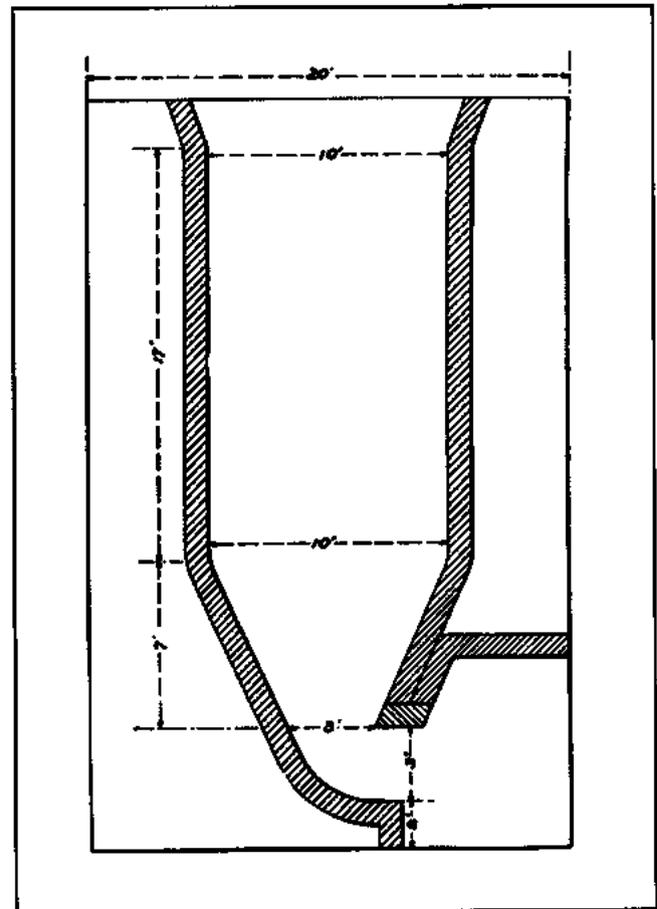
Cross-section of a typical kiln. Figure 20 from Albert Victor Bleining, "The Manufacture of Hydraulic Cements," *Geologic Survey of Ohio*, Bulletin No. 3 (1904): 188.
